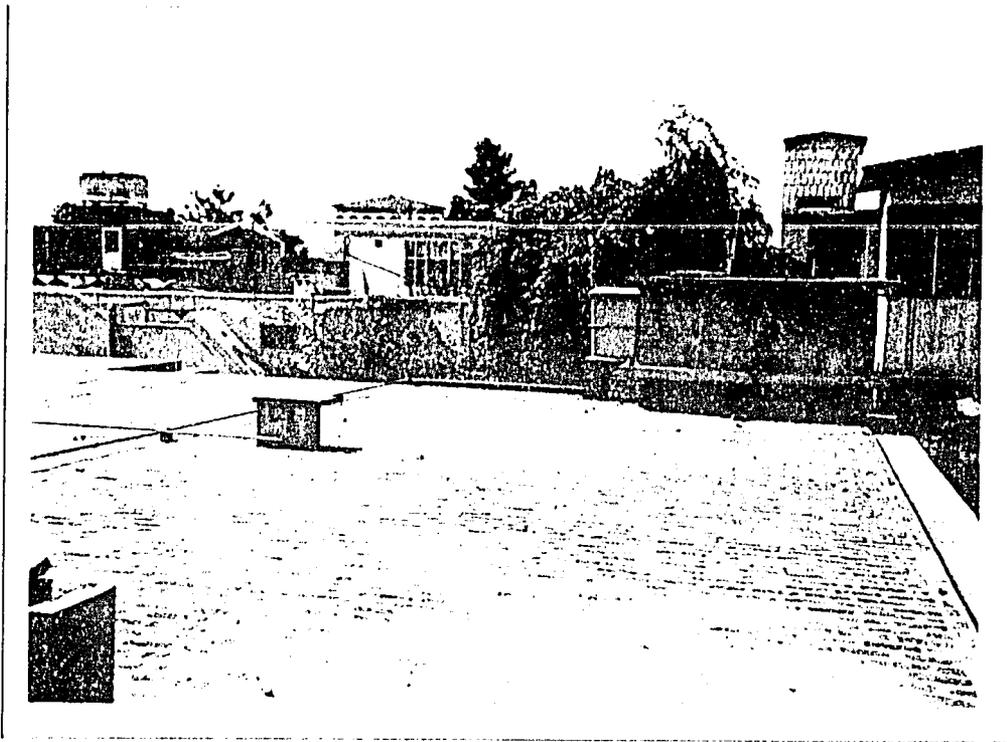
Peshawar VITA Office Facility. Roof top facing south. Chimney with conduit to equipment room center, left.
